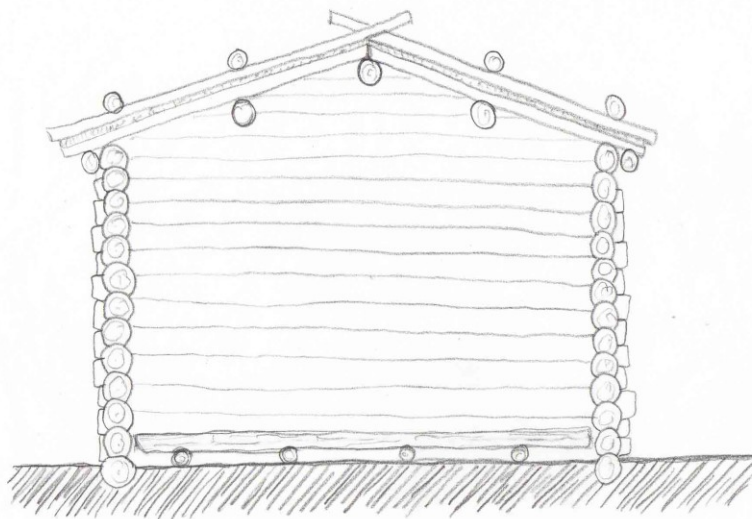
This section sketch presents walls, roof and floor structures. Wood was the main material for the house construction.
